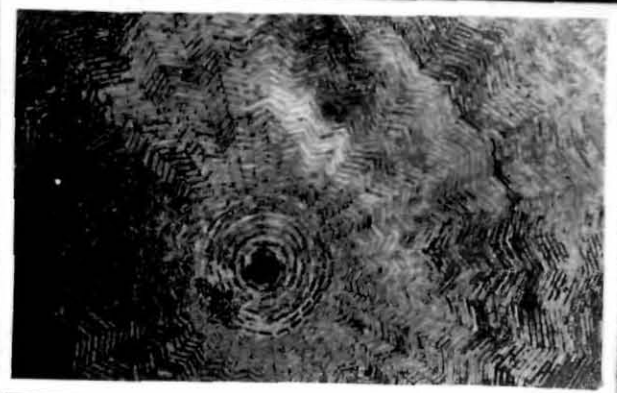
Doraha : Sarai, northern gateway, brickwork in the ceiling
